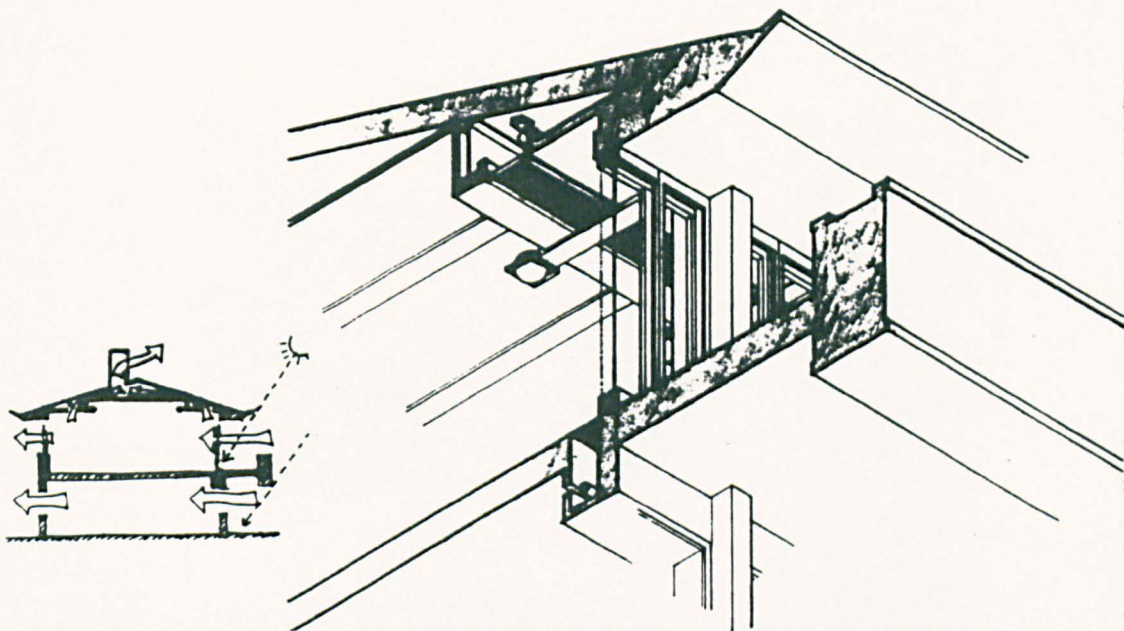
Robie House, cutaway drawing showing detail at south face of living and dining rooms. Note deep shading provided by eaves, floor to ceiling glass doors, recessed perimeter finned-tube heating, 'sunlight' globes and 'moonlight' recessed incandescent bulbs. The pattern on each oaken grille is unique.
